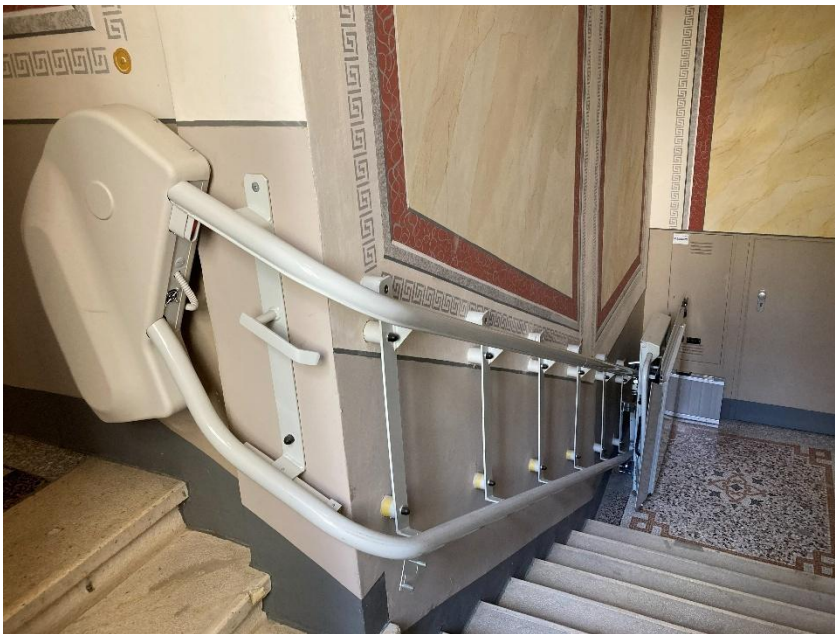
Accessible stairlift connecting the entrance area on the ground floor with the access to the meeting room on the mezzanine
